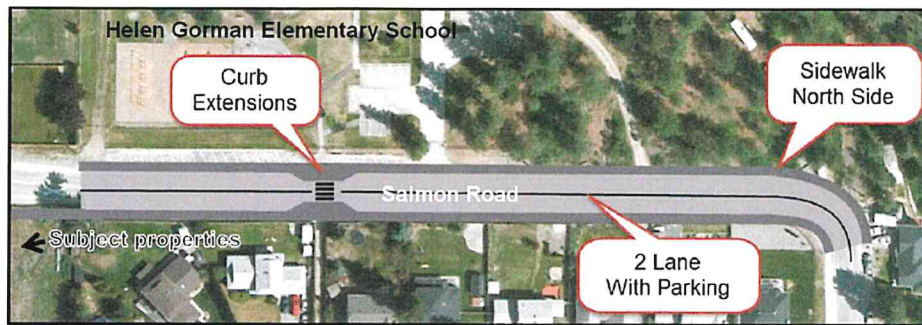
Illustration of proposed curb extension at crosswalk to improve pedestrian safety
